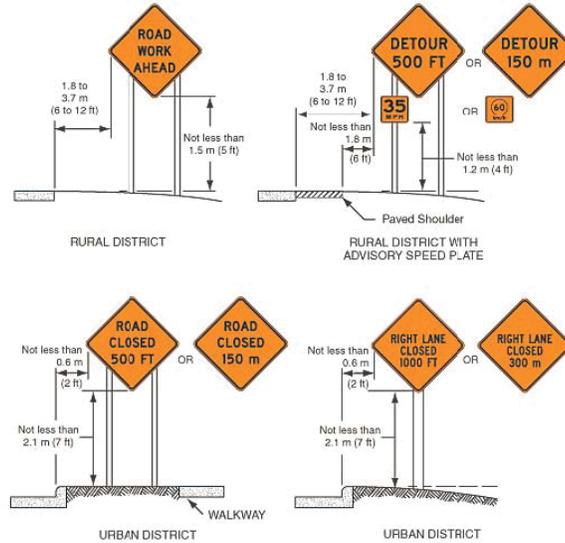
F-1. Height and Lateral Location of Signs—Typical Installations
